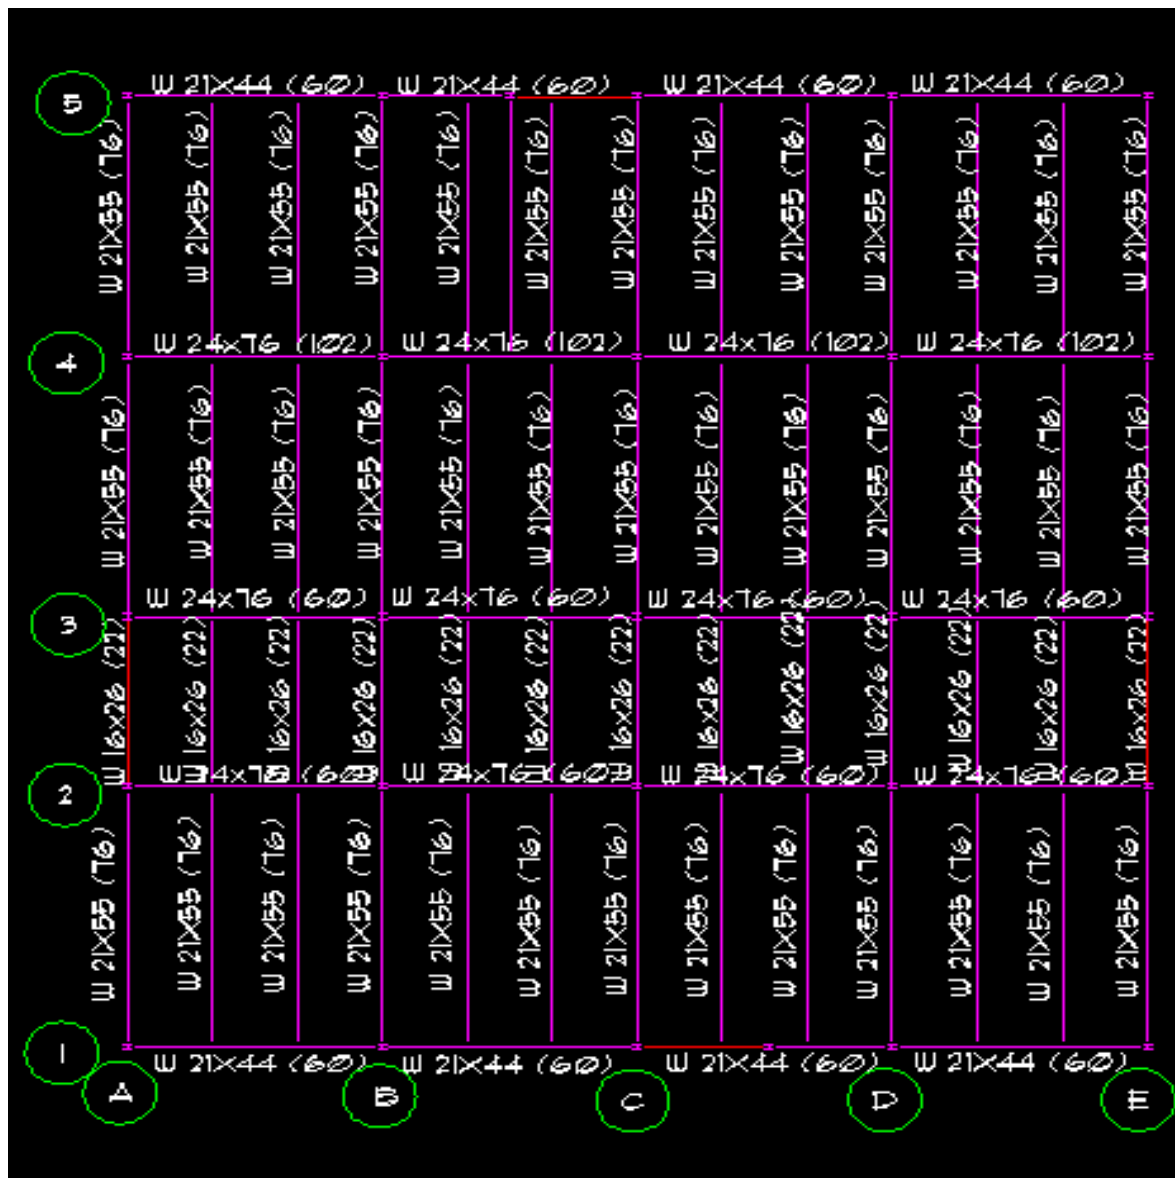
Typical Composite Floor Plan 200 & 300 Levels
